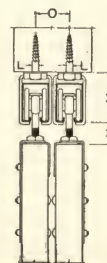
Cross-section showing overhead bracket attachment without weatherstrip, of two parallel sliding doors.
